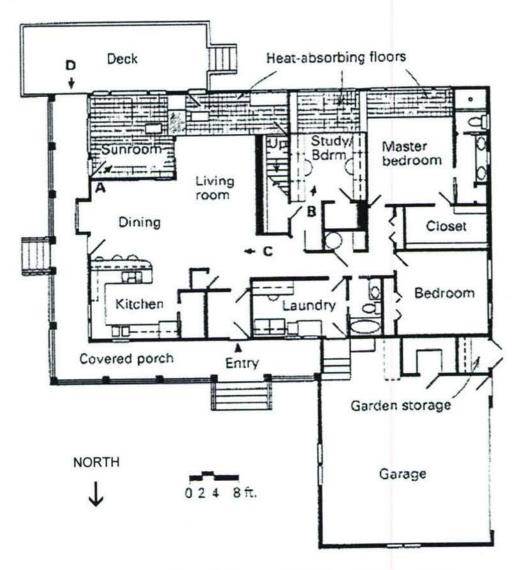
Floor Plan of Plumblee Residence (Rucker 1993)
